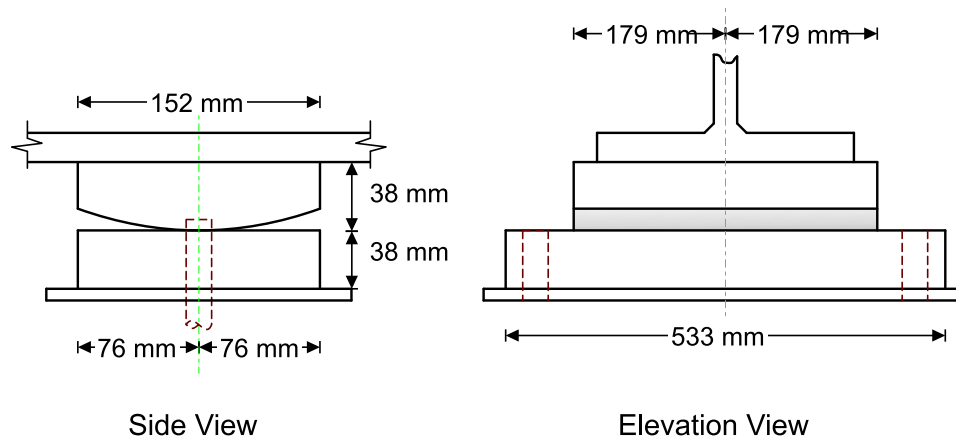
Dimensions of Low-Type Fixed Bearing.
